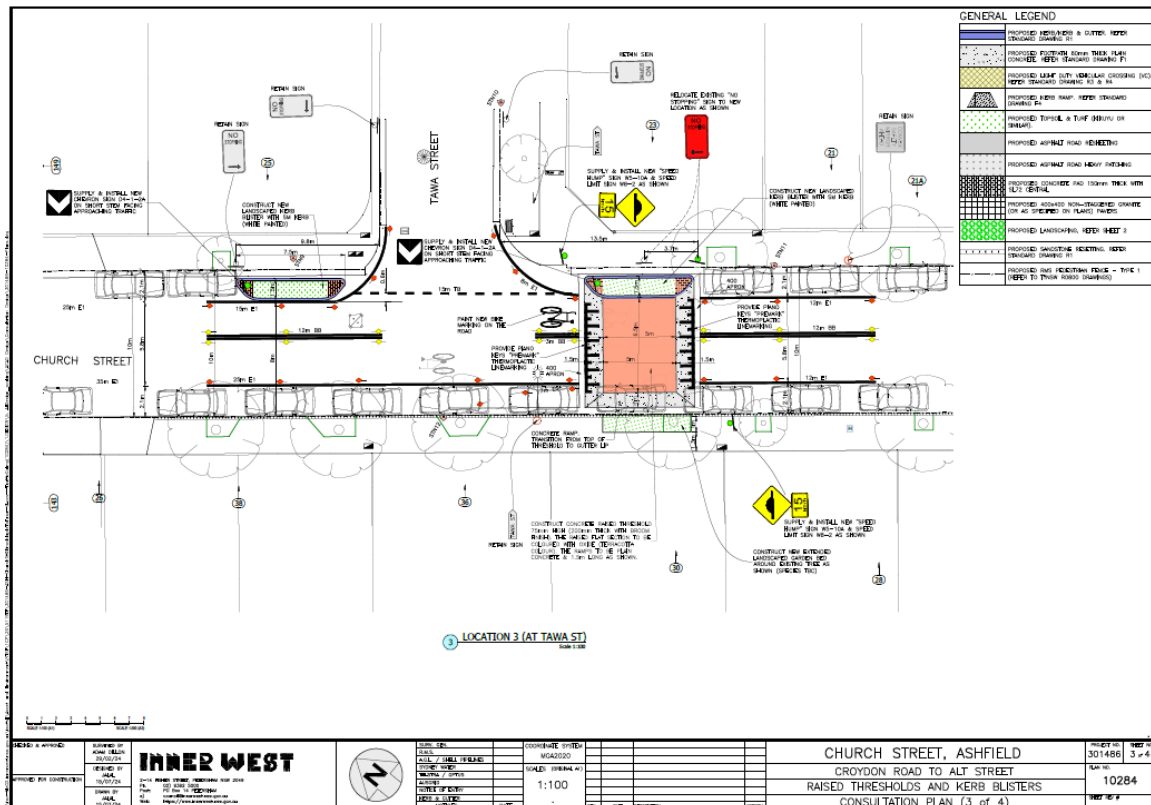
Initial consultation plan 10284 (plan 3 of 4)
